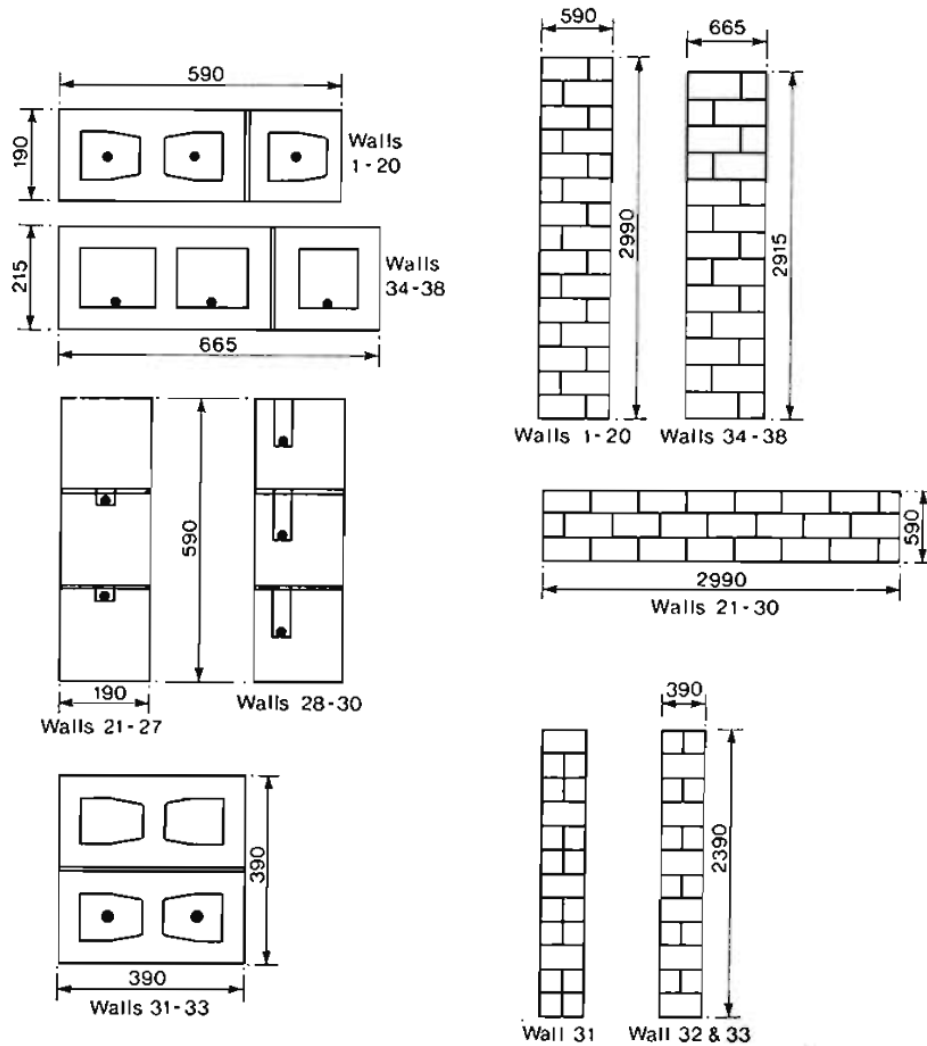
Wall Test Specimens (Cranston and Roberts 1976)
